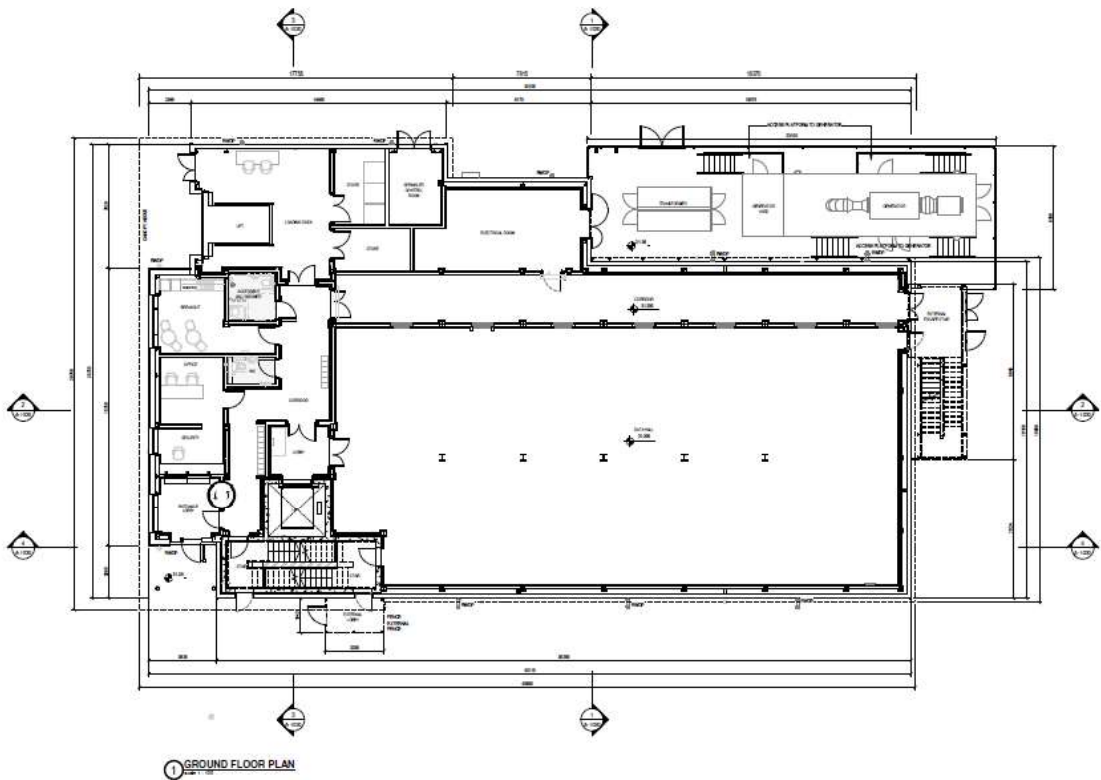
Proposed Ground Floorplans (please note – a larger version of plan can be found in the Committee Plan Pack)
